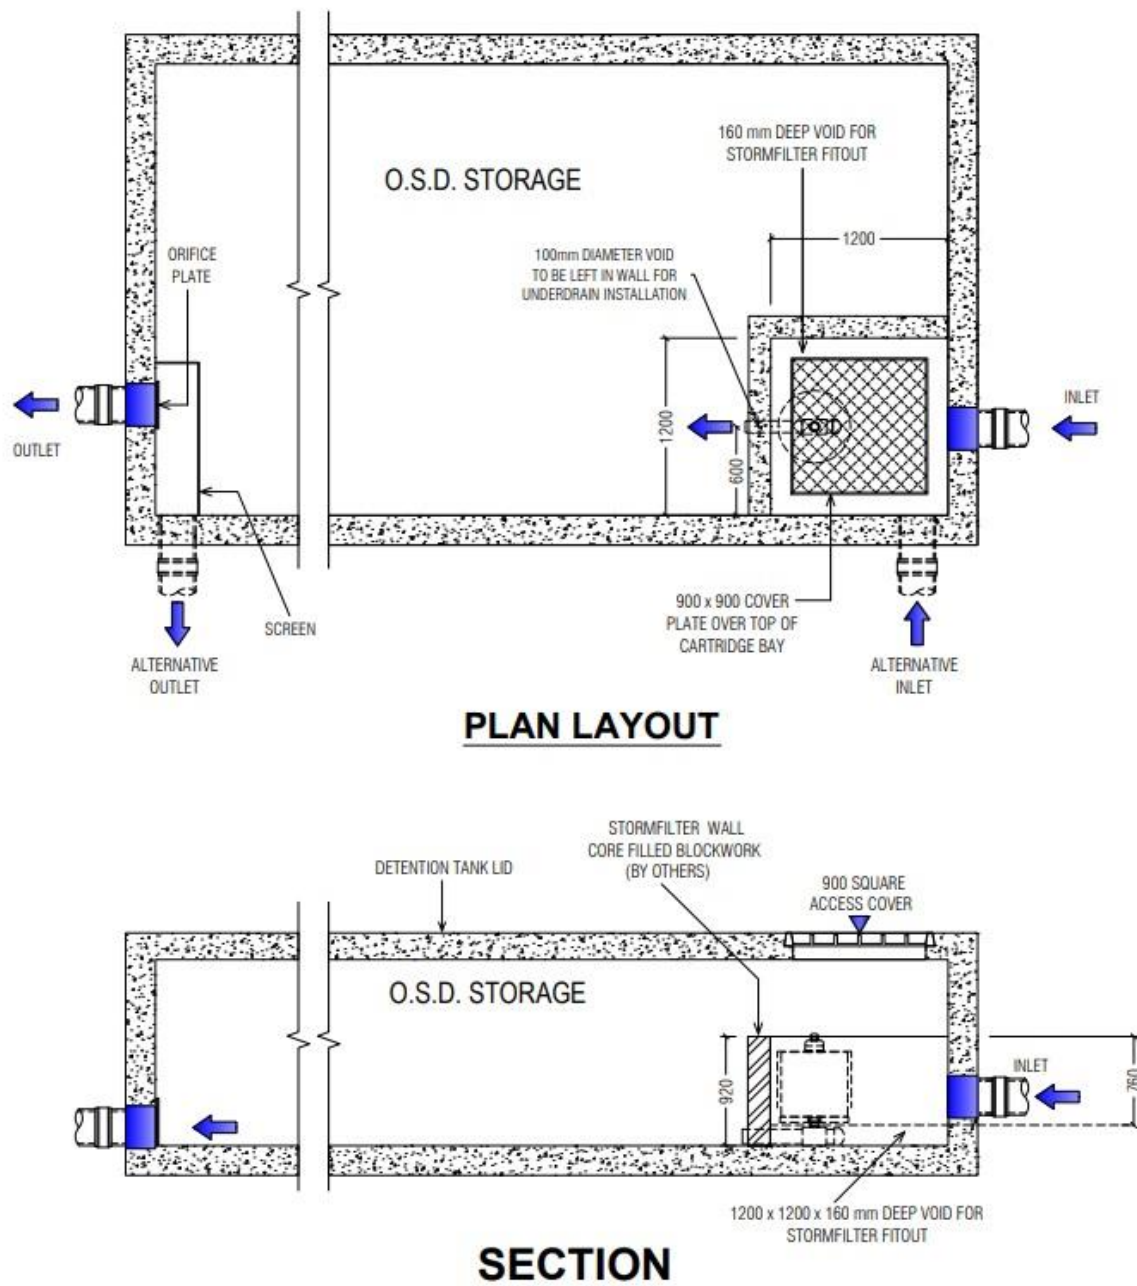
Typical Plan and Section of combined OSD and StormFilter Unit (Source: Ocean Protect)
